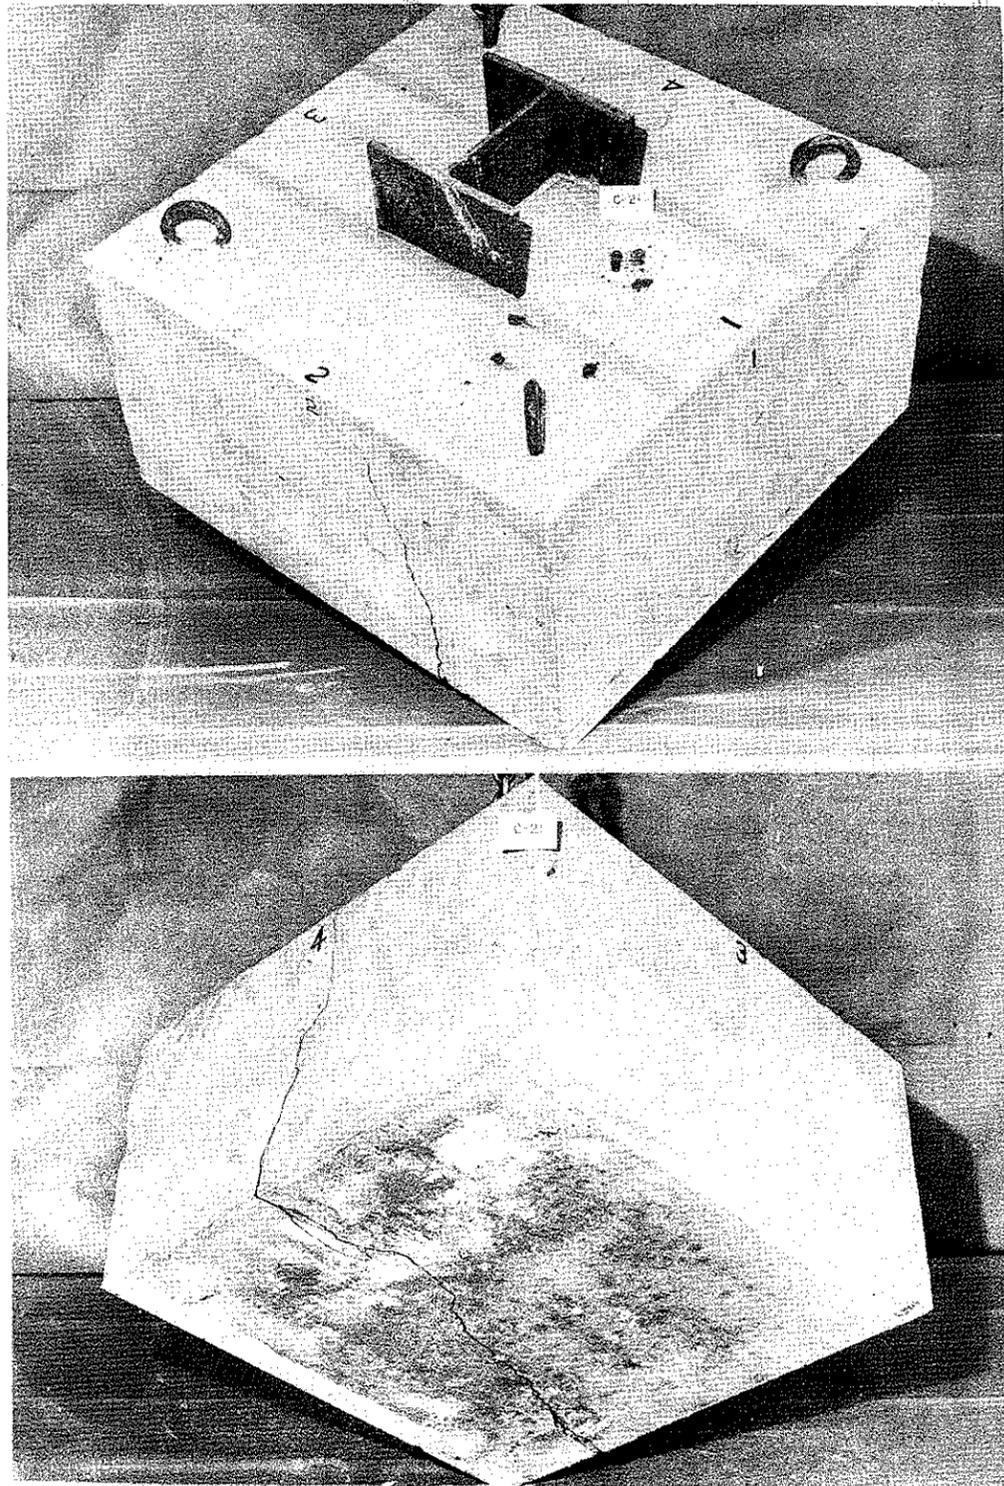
APPEARANCE OF SPECIMEN C-21 AFTER TESTING.
